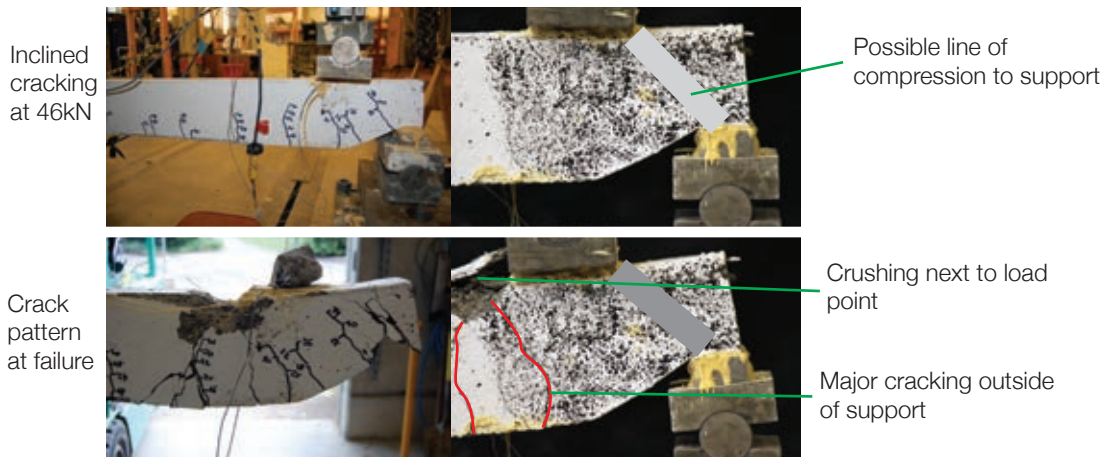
Crack distribution and failure mode, Beam 9\_4\_CFP\_V.
